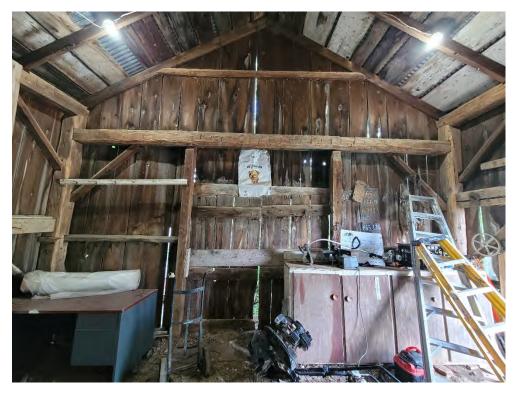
Interior of the driveshed with drop tie-beam, hand-hewn posts and plates and east doorway, facing east
